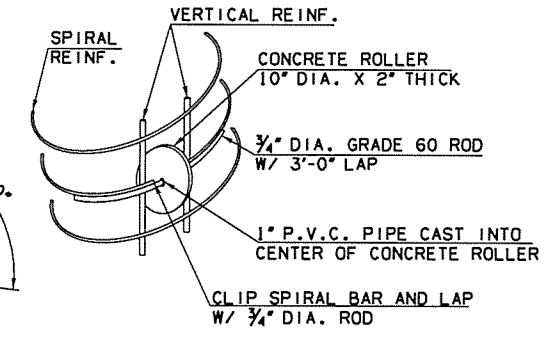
DETAIL OF DRILLED SHAFT ROLLER PLACEMENT
